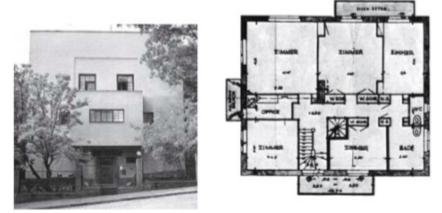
Compartmentation as a Principle: Elevation (top) and Plan of Upper Floor (Right). Adolf Loos: Müller House, Vienna ,1928
